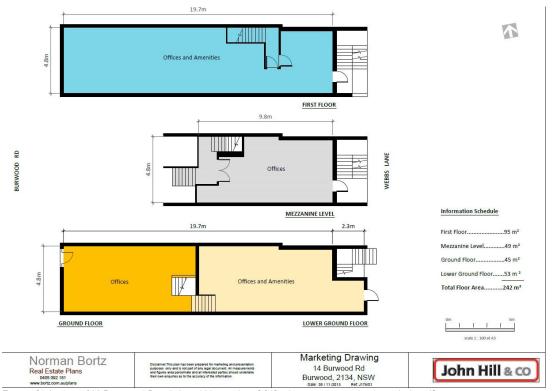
A plan of 14 Burwood Road dated November 2013, showing a greatly altered plan. (Source: RealEstate.com.au)
